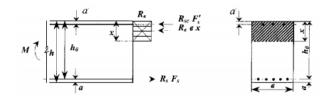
Diagram of forces on the section normal to the longitudinal axis of a flexural reinforced concrete member in calculation of its strength
